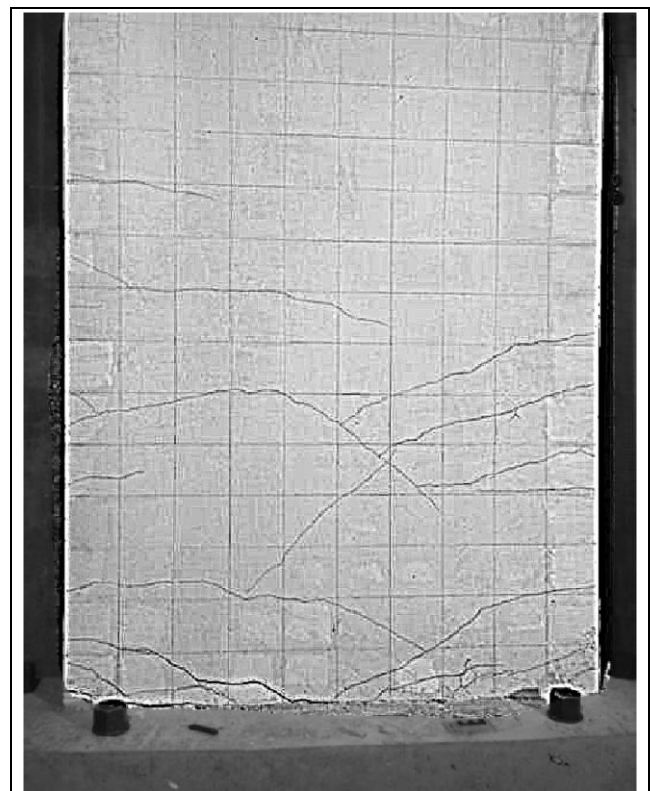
Failure modes of ferrocement walls subjected to cyclic loading conditions
